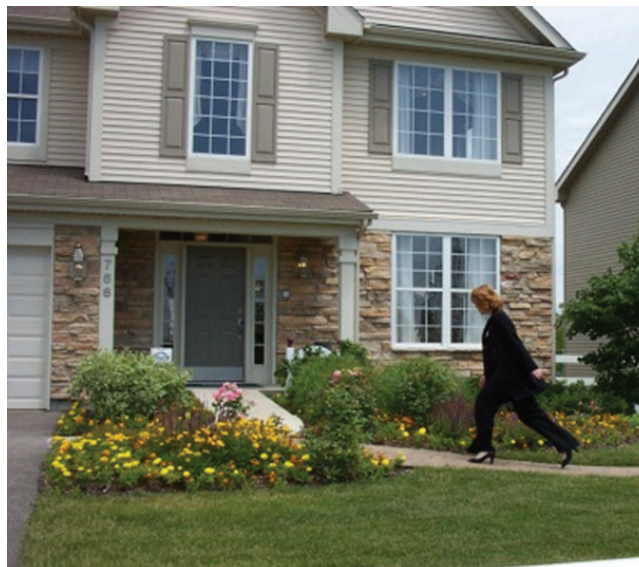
Visitable house in Bollingbrook, Illinois (Concrete Change)
